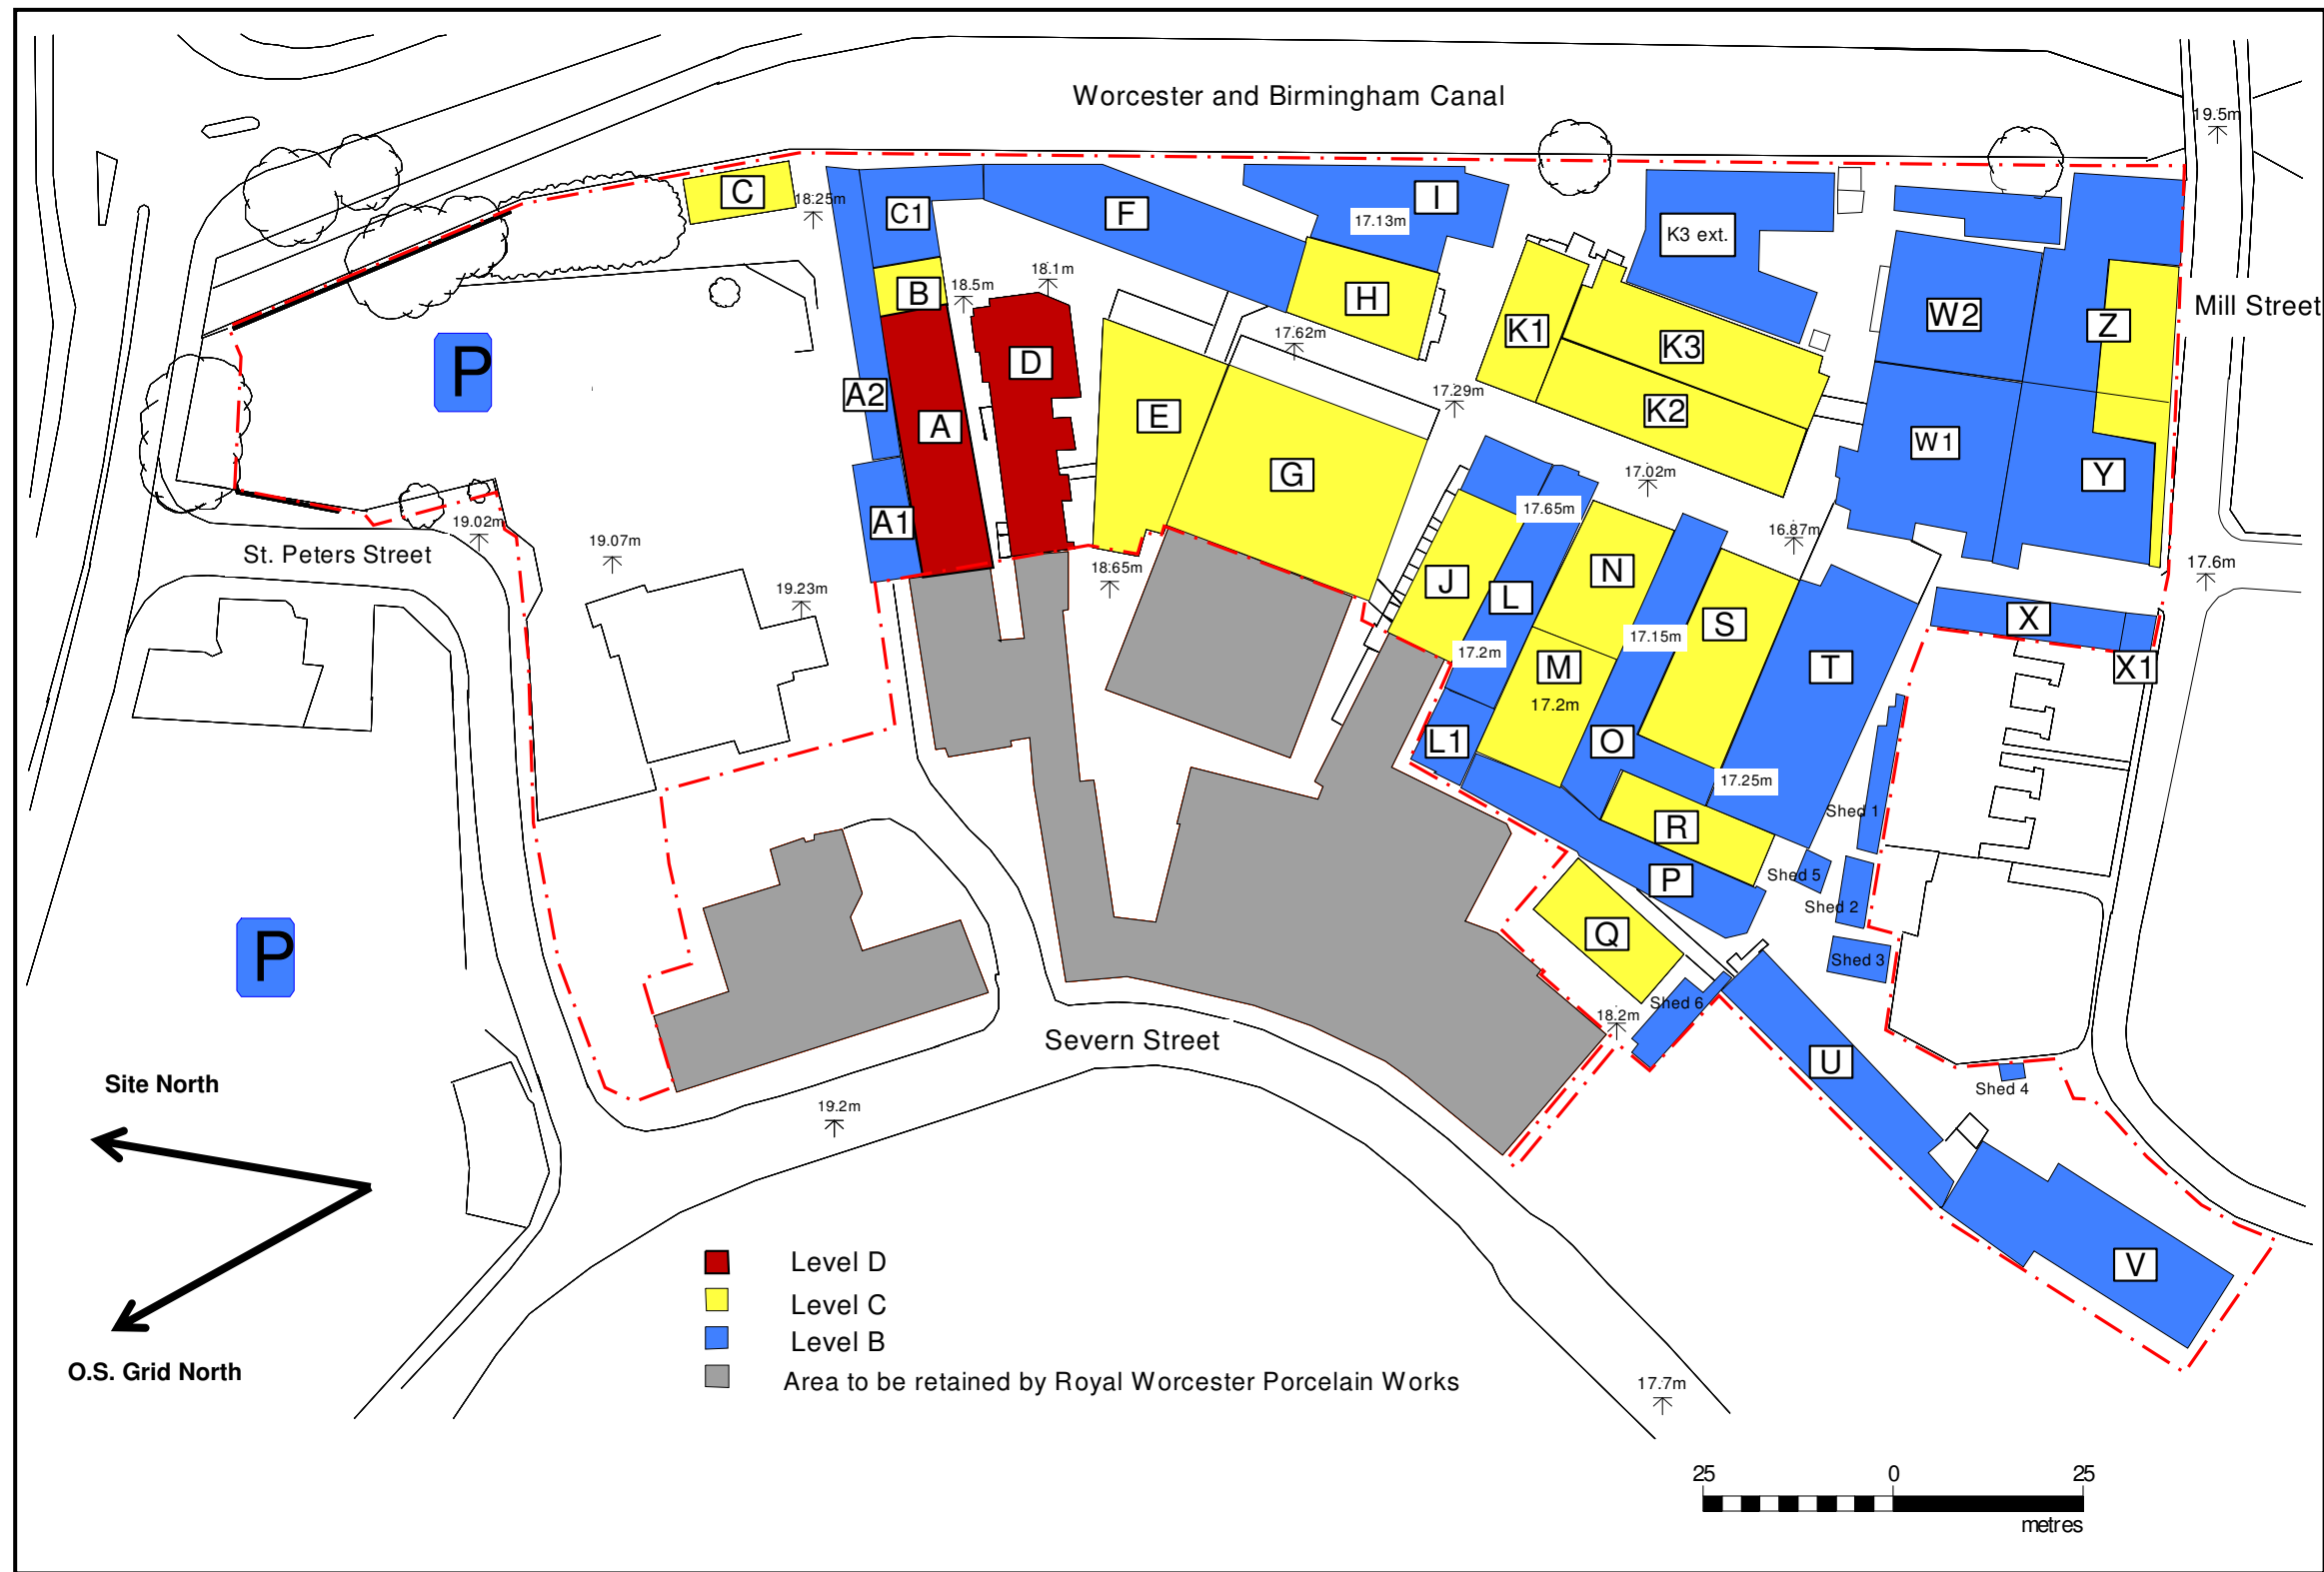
Detailed plan of site, building codes and levels of recording (scale 1:1,000 based on architect's drawing provided by Berkeley Homes)
